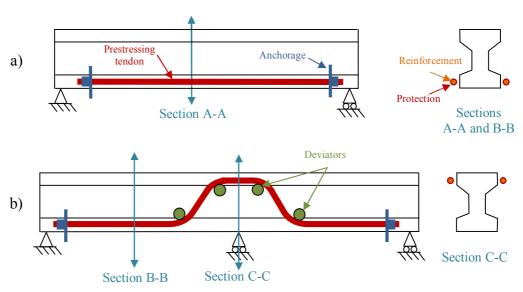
Sketch of the principle of external prestressing on a) simply supported beams b) continuous beams
